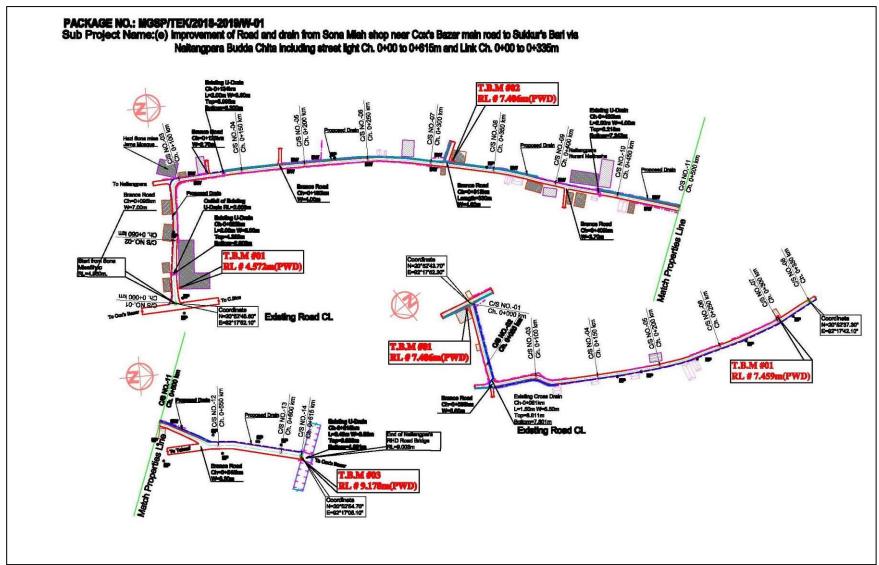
(e): Layout Plan for the proposed Subproject e) Sona Miah shop near Cox's Bazar main road to Sukkur's Bari via Naitangpara Budda Chita
